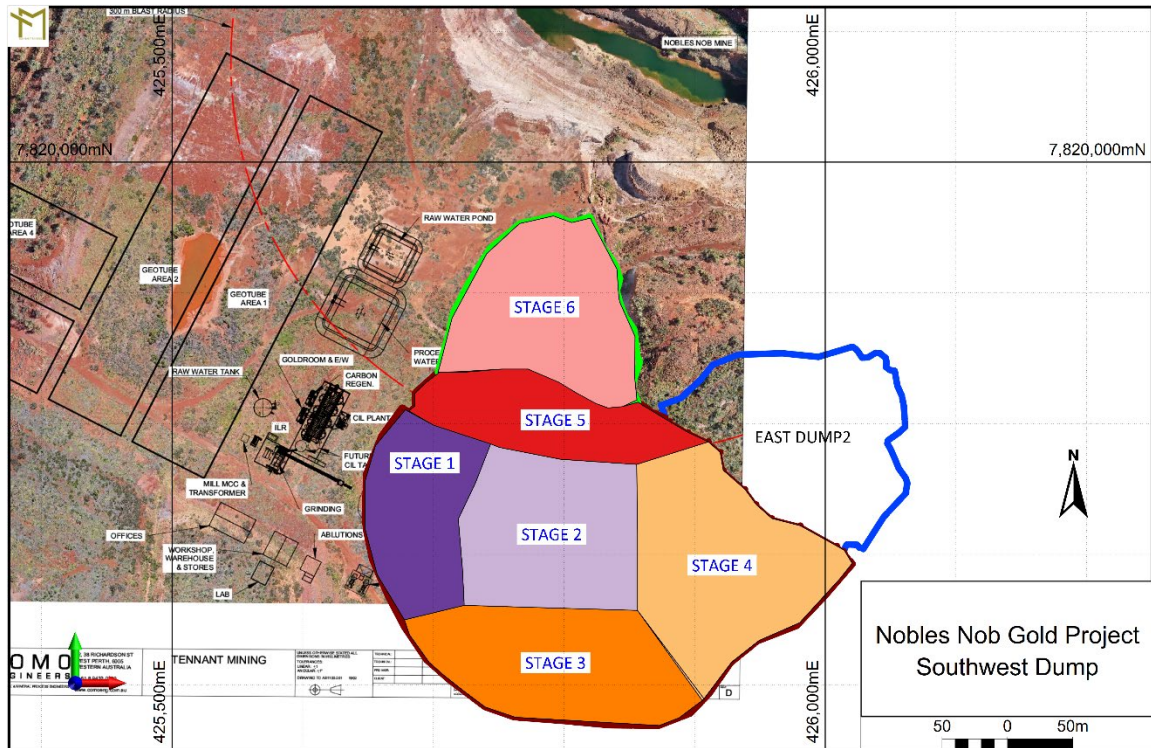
Plan view showing planned plant layout in relation to the SWD and Stages of dump reclamation
